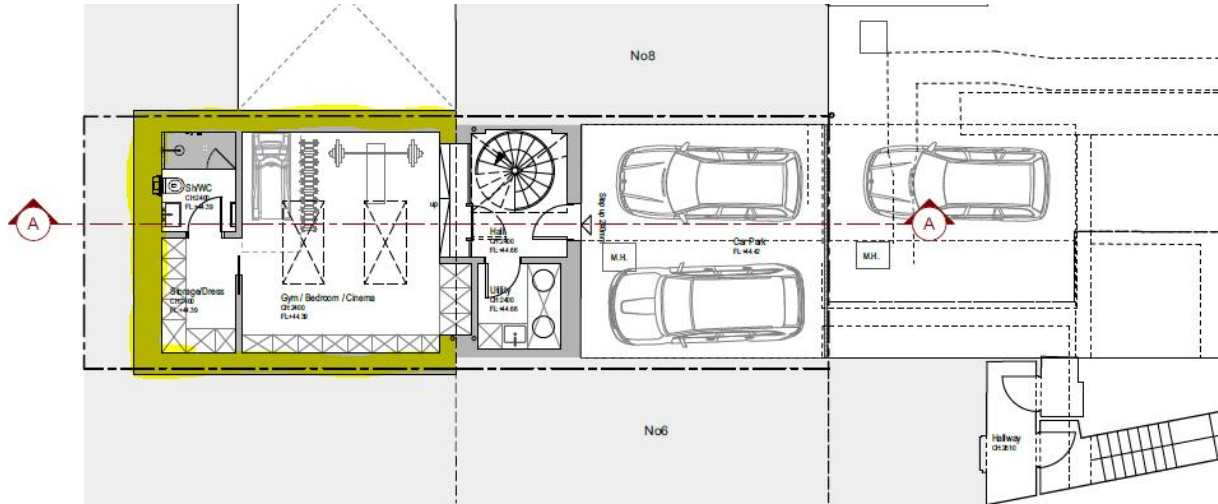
PROPOSED BASEMENT (HIGHLIGHTED) BELOW EXISTING TERRACE
